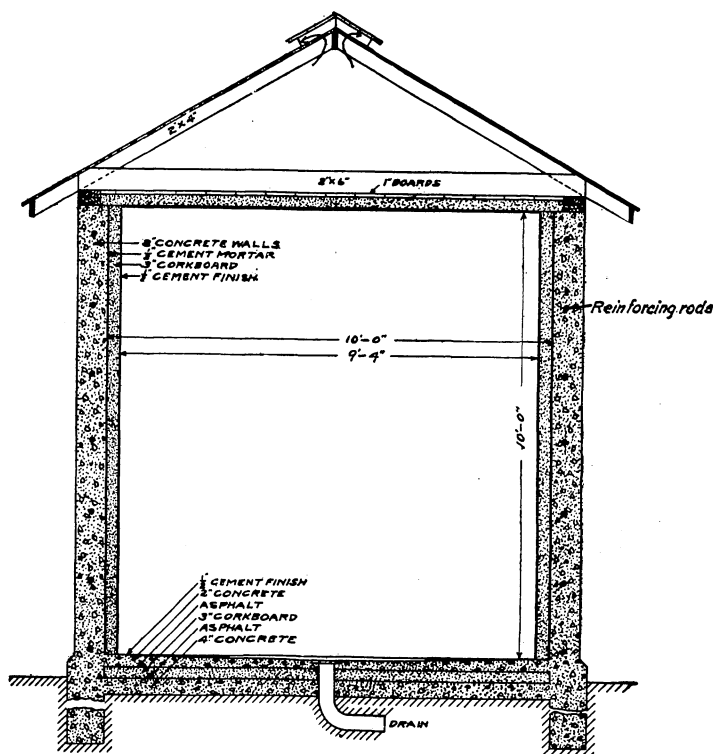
B.—A small concrete ice house. (Section on A-B of fig. 22a)
